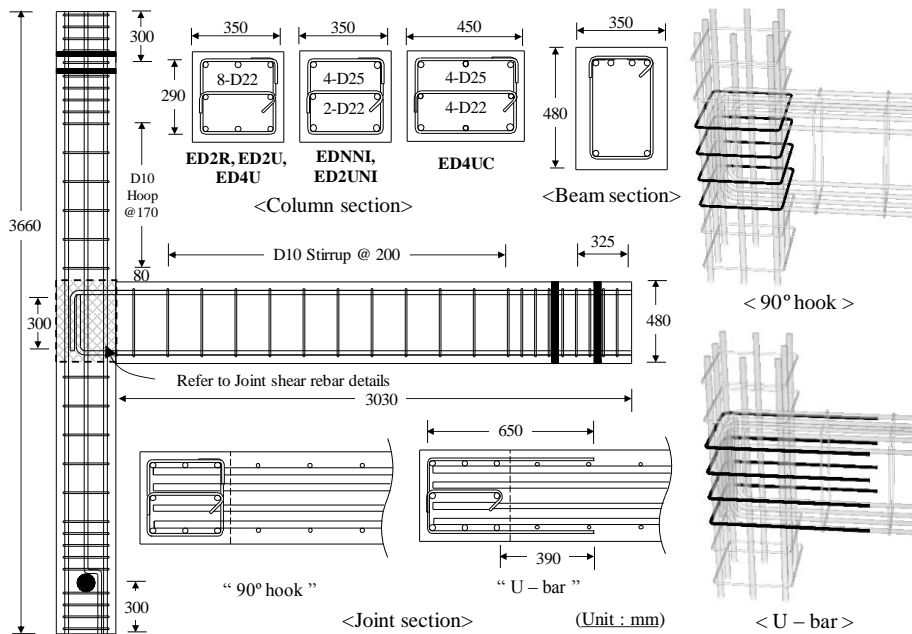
Dimensions and reinforcement details of exterior joint specimens
